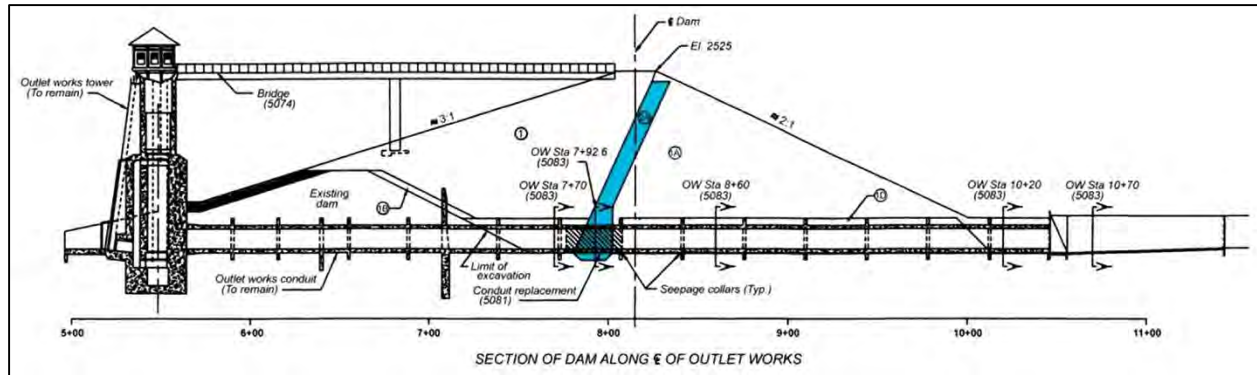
Typical filter diaphragm addition around a conduit near the centerline of a dam (outlet for filter diaphragm not shown).
